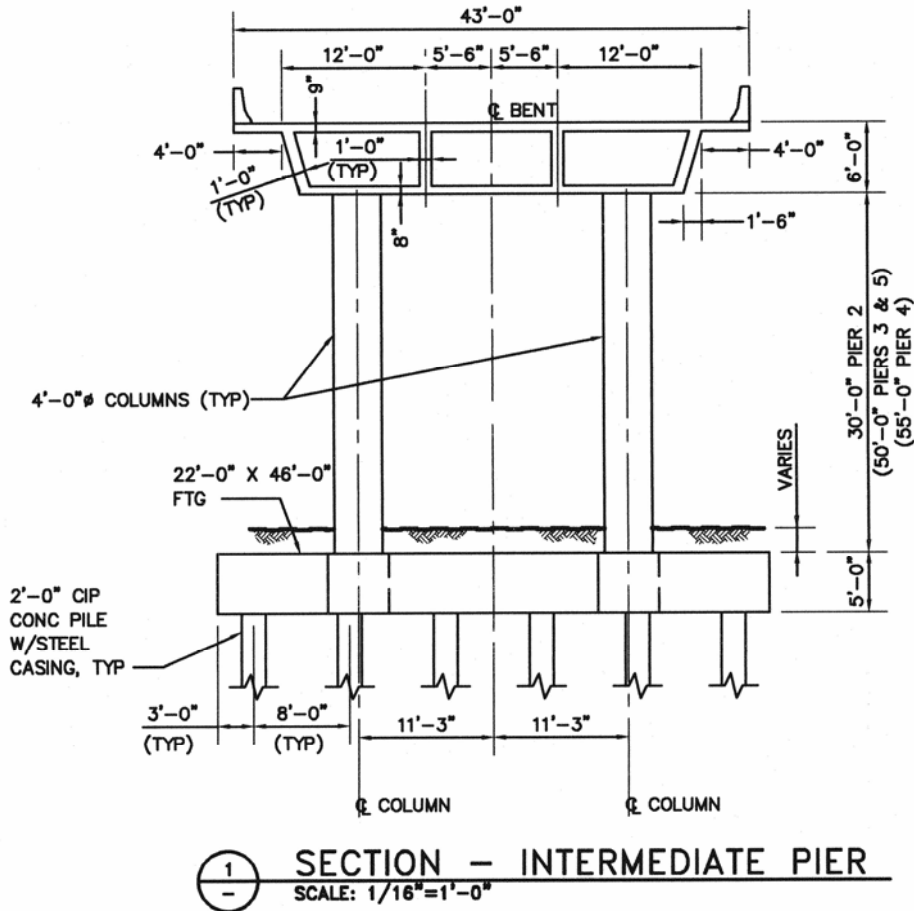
Elevation of an Intermediate Pier, Washington State Bridge
